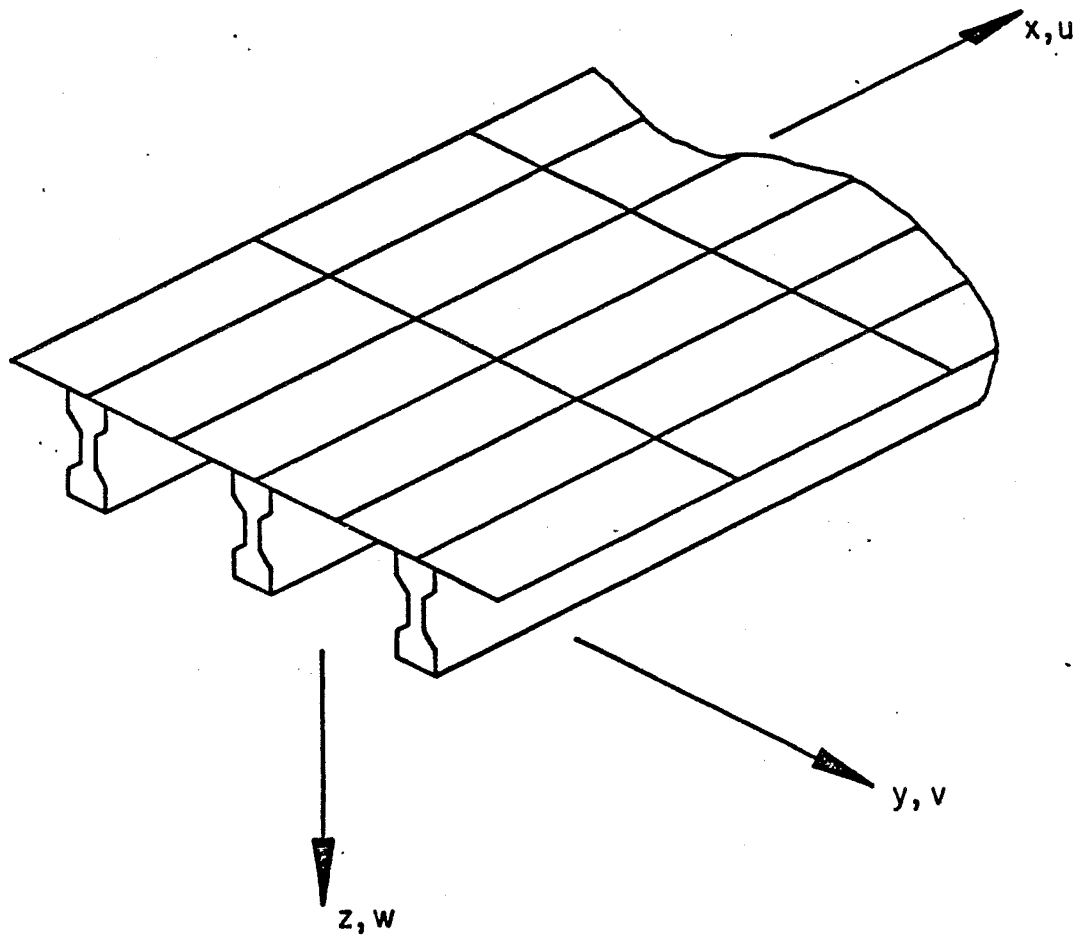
Beam-Slab Discretization of Bridge Superstructure
